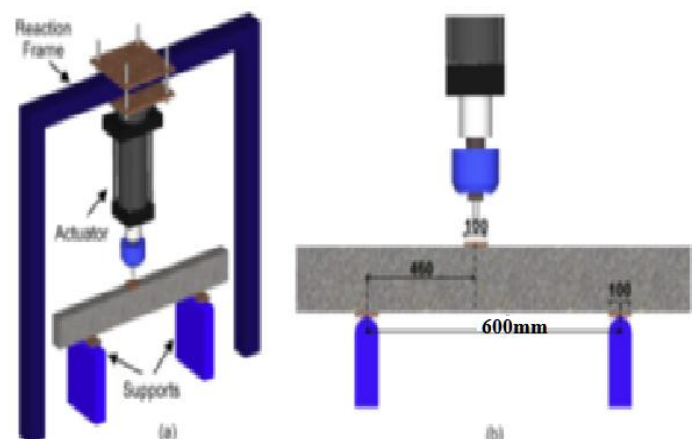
Test set-up: (a) Overall 3D view; (b) front view
